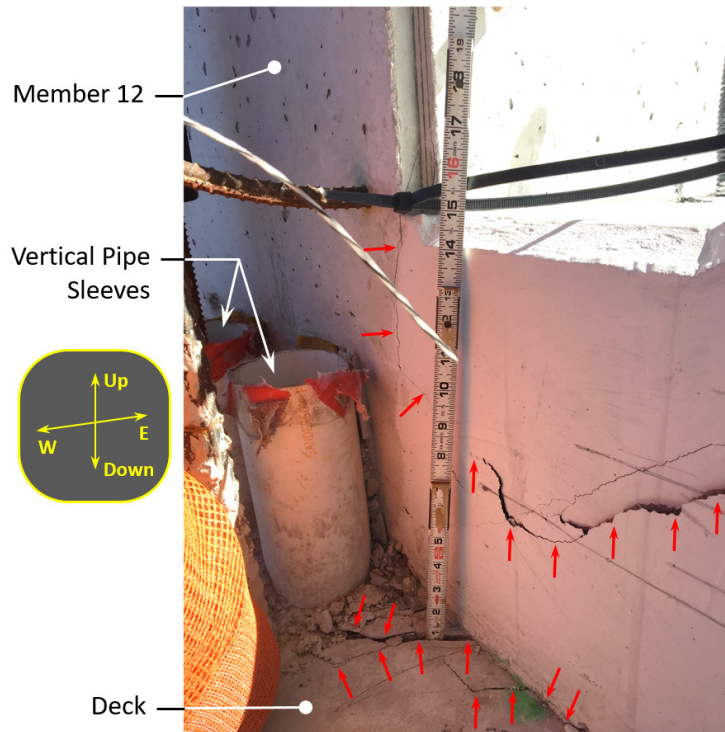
Photograph showing the west face of truss members 11 and 12 where they meet the deck on March 13, 2018 at 11:25 a.m. Corresponds to Bridge Factors Factual Report Photo 79.
